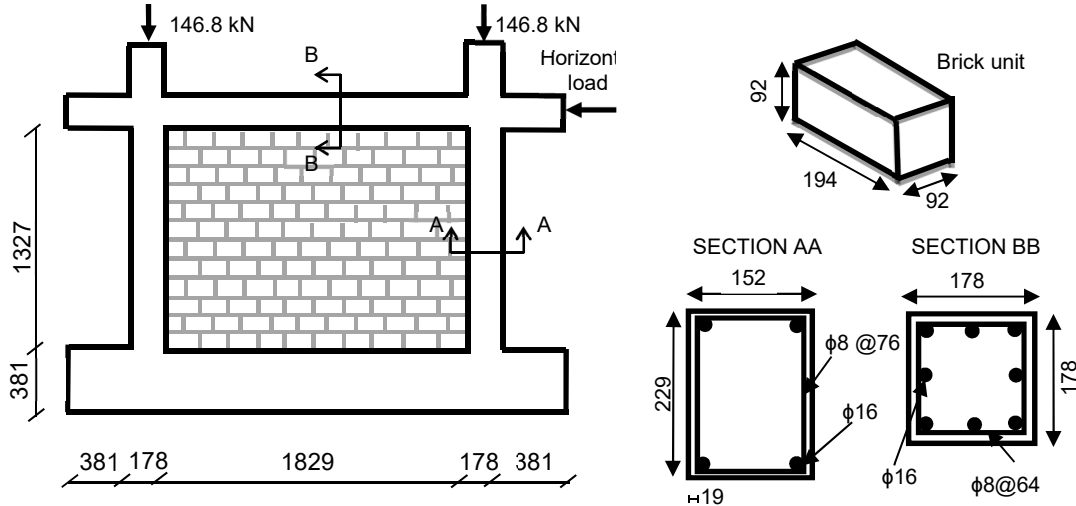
Geometric details of the infilled frame (dimensions in mm).
